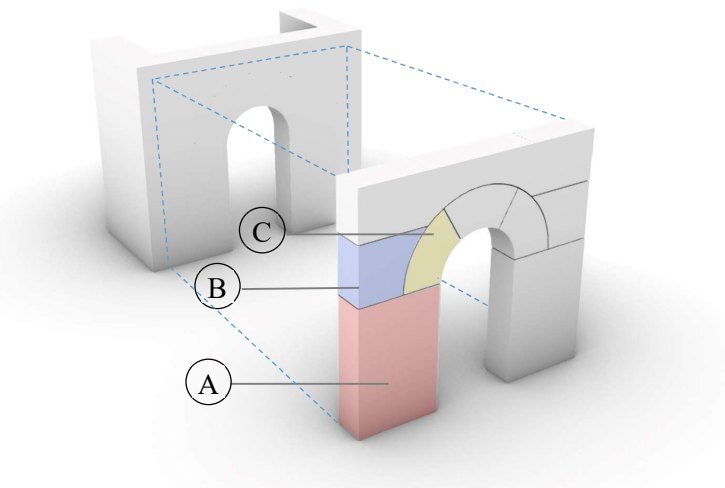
Geometry challenges in a regular cob wall with an opening. 1) Lift height- 3 axis 3D printing; 2) Inclined 3-axis printing (corbelling); 3) Inclined 6-axis 3D printing.
